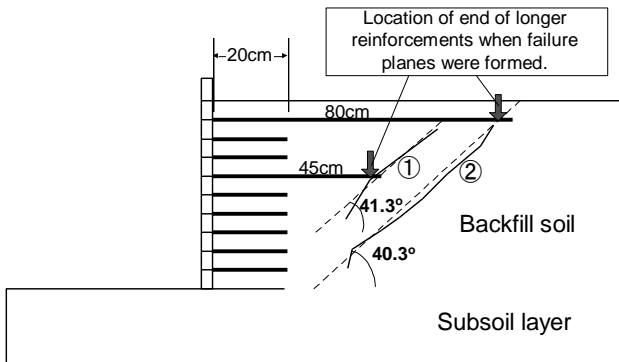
Locations of failure planes and longer reinforcement layers for GRS-RW (type 2)
